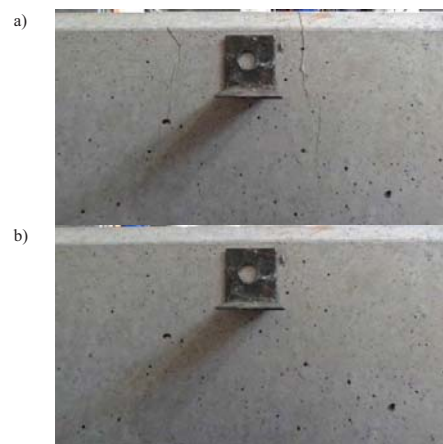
Crack opening under load (a) and partial closure after unloading (b) in a prestressed concrete sleeper subjected to center-bound simulation
